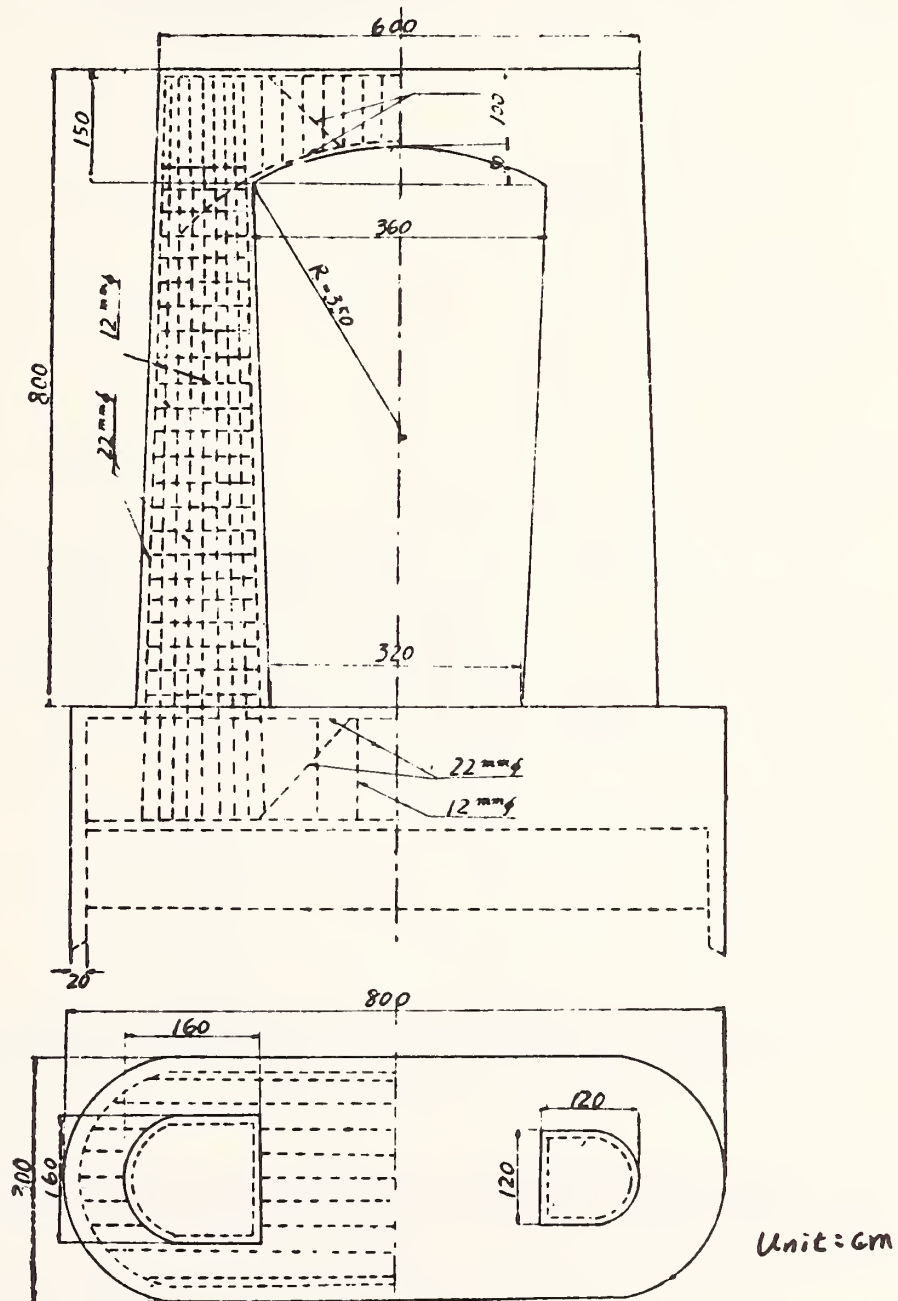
Detailed drawings of the pier of the Nakazuno bridge
